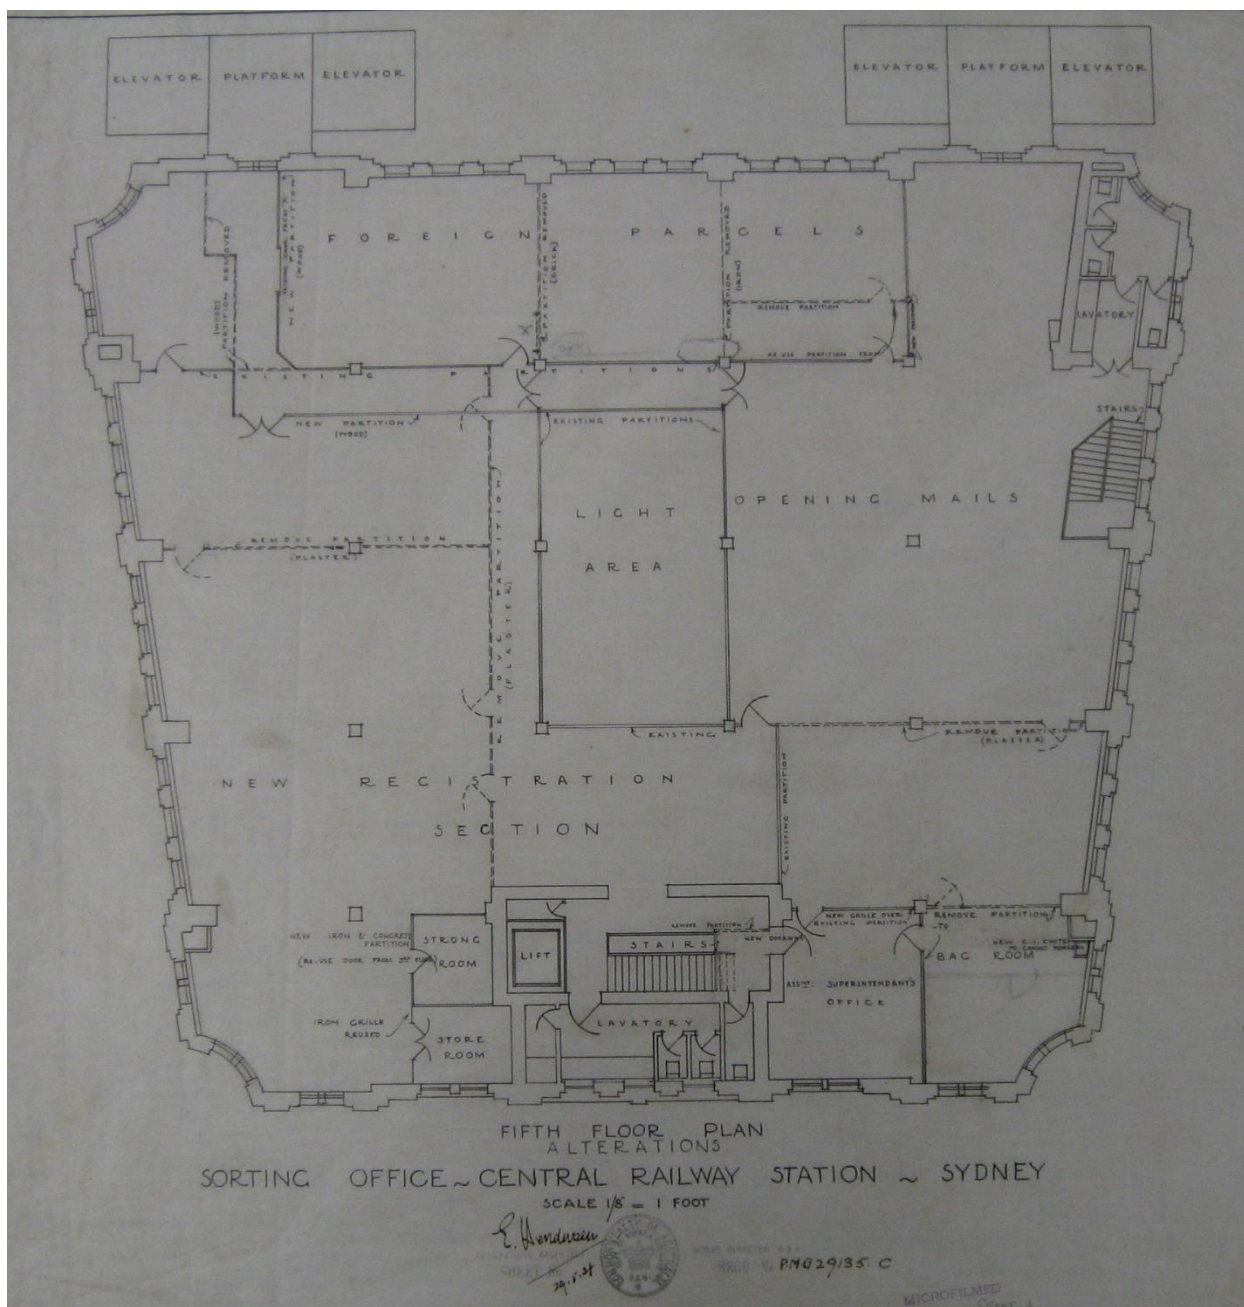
Sorting Office Central Railway Station Sydney, fifth floor plan alterations, 1929. Signed by G Henderson, Supervising Architect
